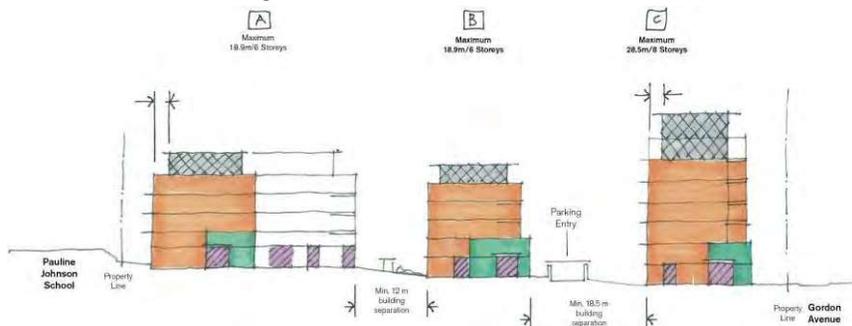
Conceptual Sketch of Street Wall and Building Massing Along 22nd Street
